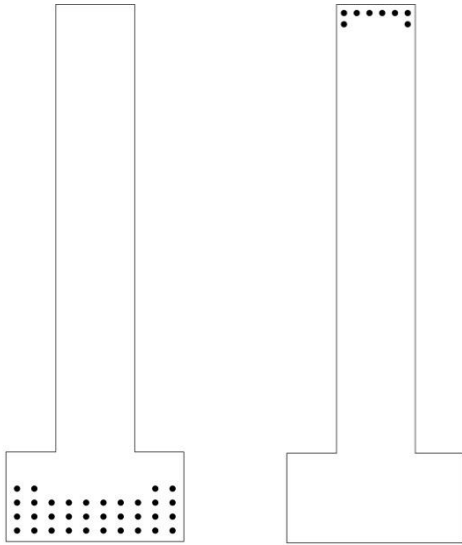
Arrangement of the reinforcement in the top and in the bottom of the leg in Section cp, a) bottom reinforcement, b) top reinforcement.
